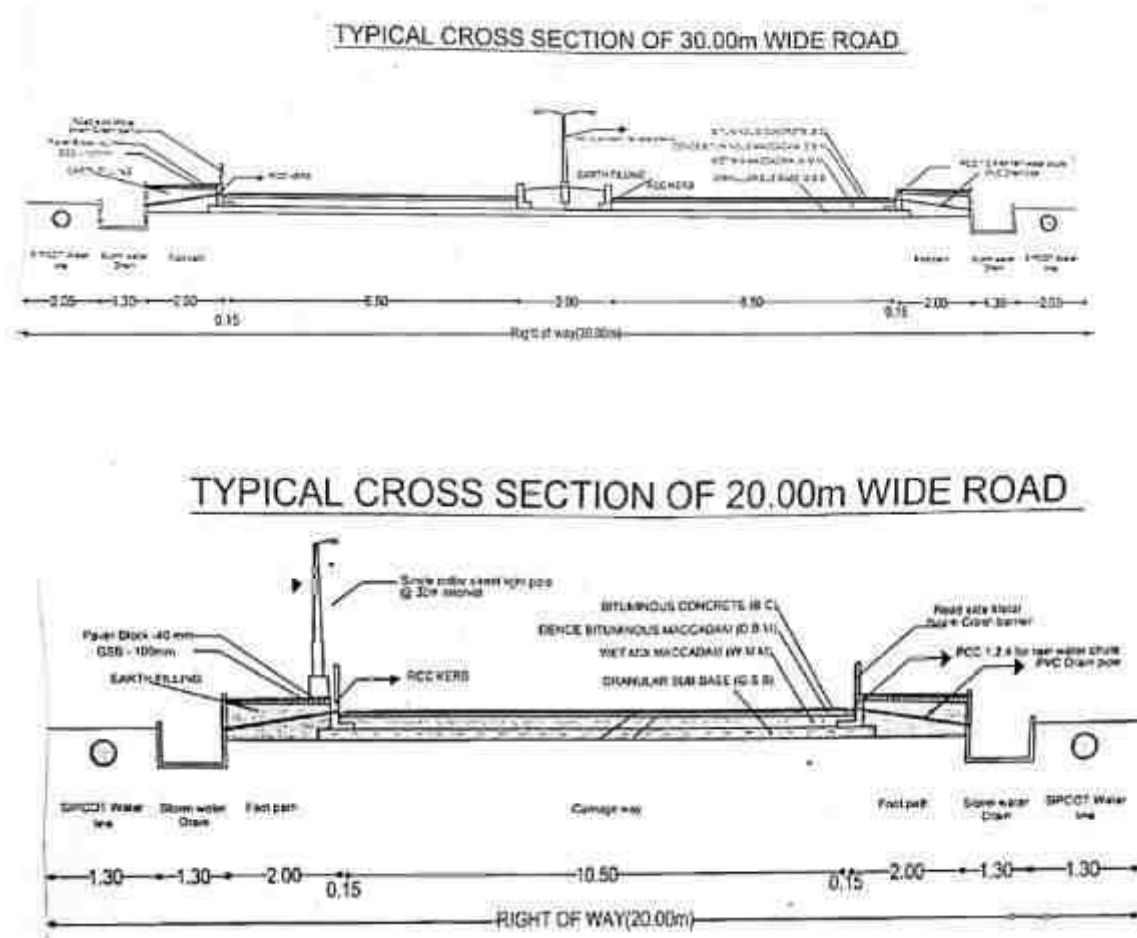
Typical Road Cross-section of 30 m & 20 m ROW
